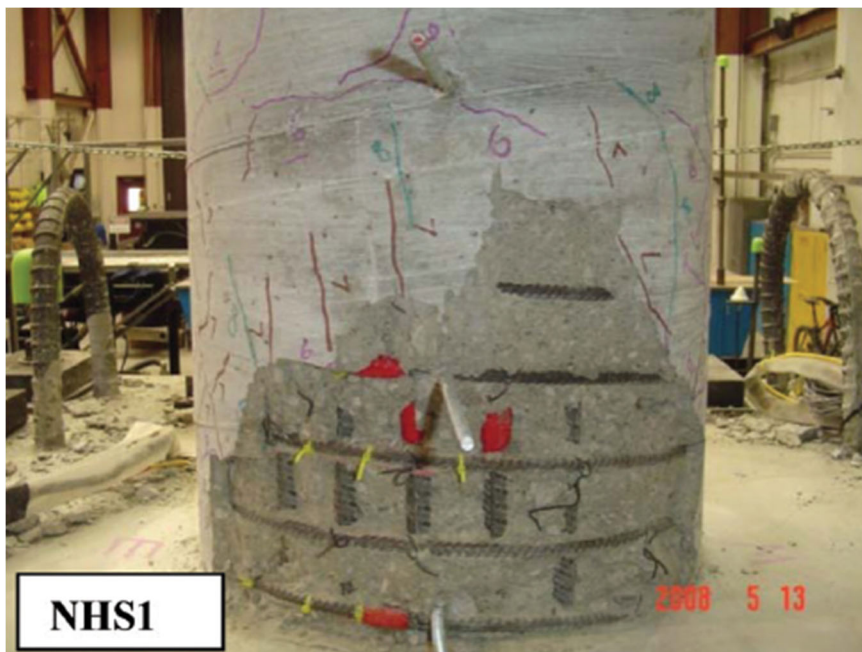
Specimen NHS1 (C18) from Vosooghi and Saiidi (2013) following failure, shown as an example of a column with spalling as its primary damage state.
